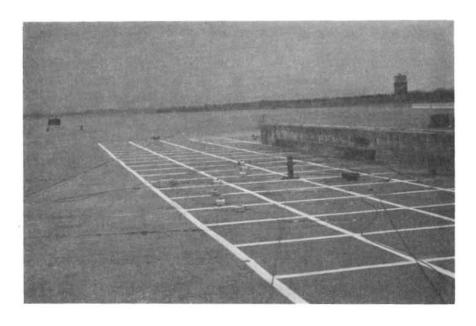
RETROFIT CONCRETE BARRIER RAIL DAMAGE, TEST 12-3
